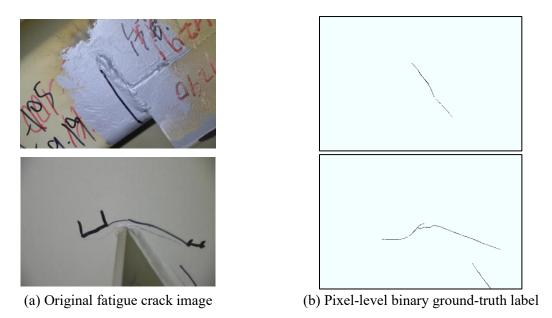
Examples of the steel box girder fatigue crack image dataset.
